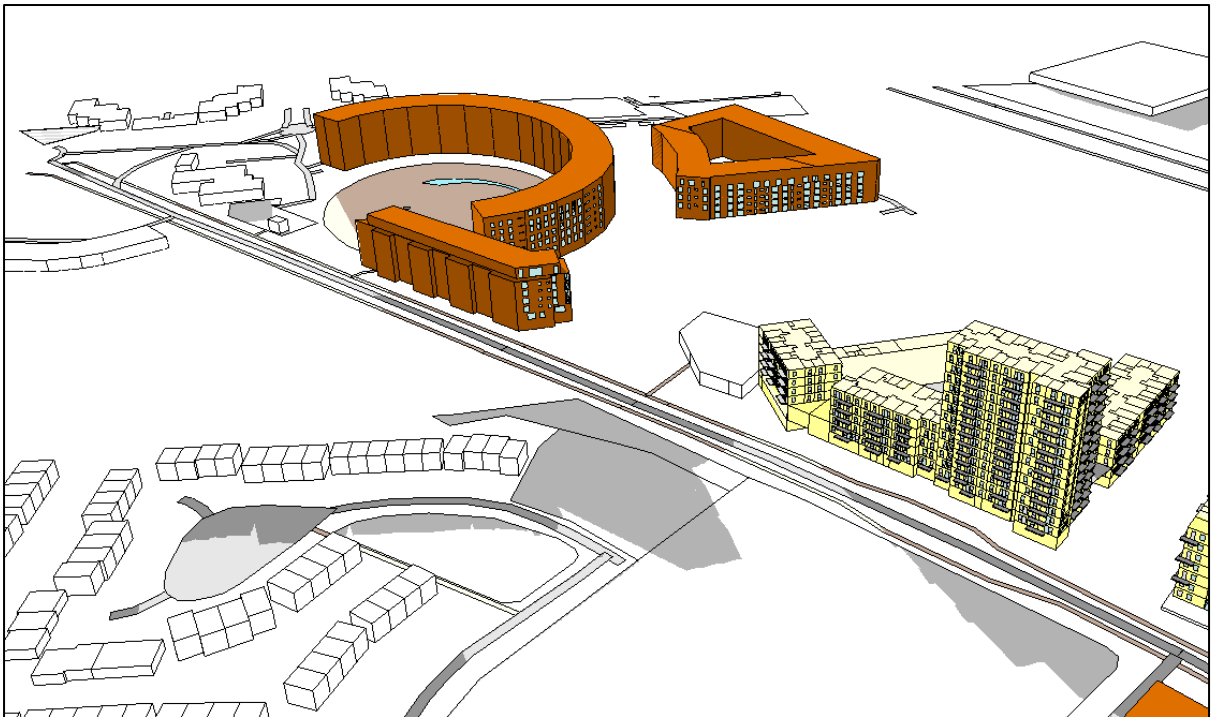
Shadow image on December 21<sup>st</sup> at 12:00 of Park West with Proposed Development (modelling software)
